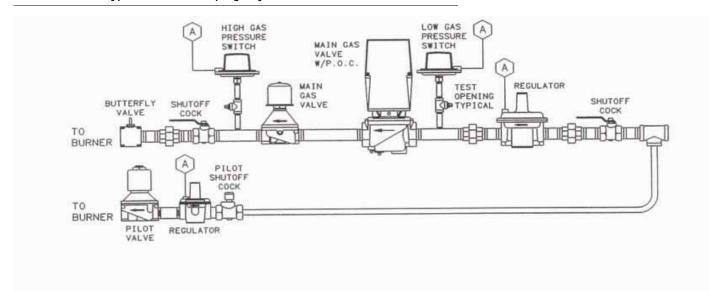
Typical U.L. Gas Piping Layout Model M 28-42
